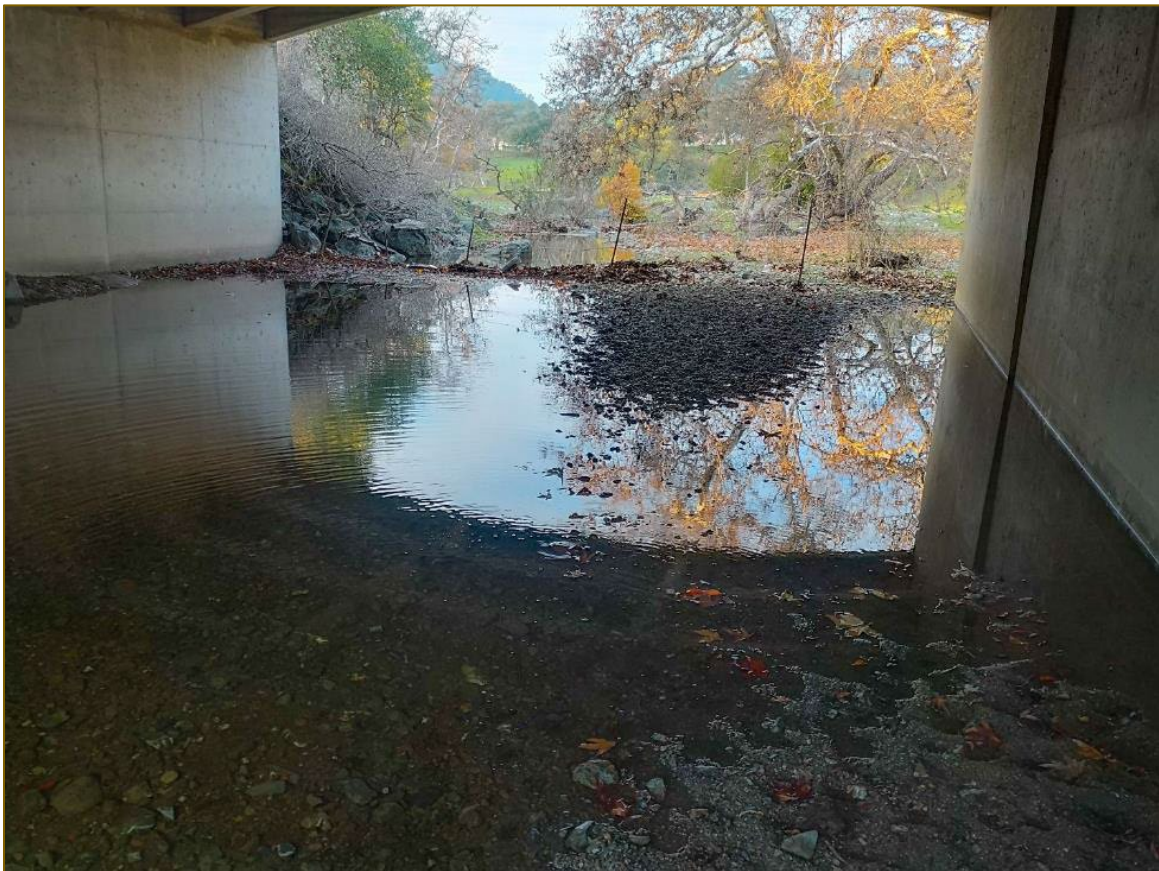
View of water level and fencing on 2021-12-21 at center section of bridge 370466. Facing north.
